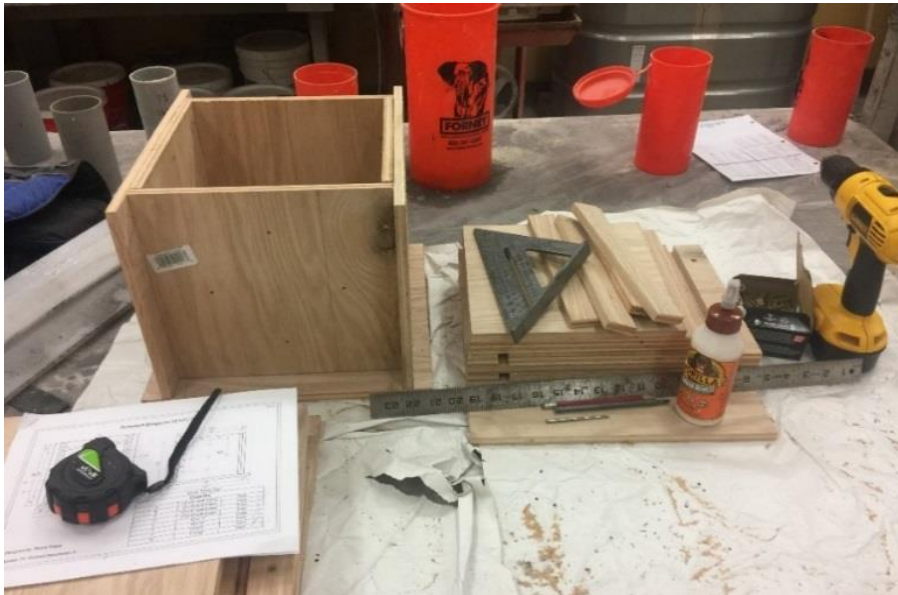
Construction of wooden formwork for 10 in. concrete cubes, with holes for strain measurement studs.
